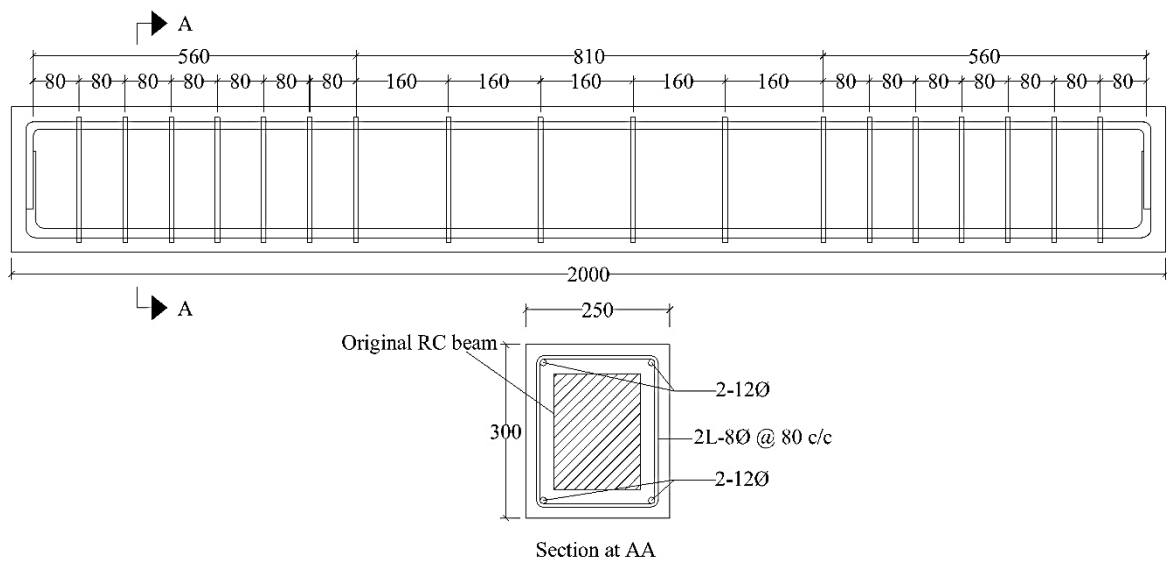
Details of jacketed RC beams (All dimensions are in mm).
